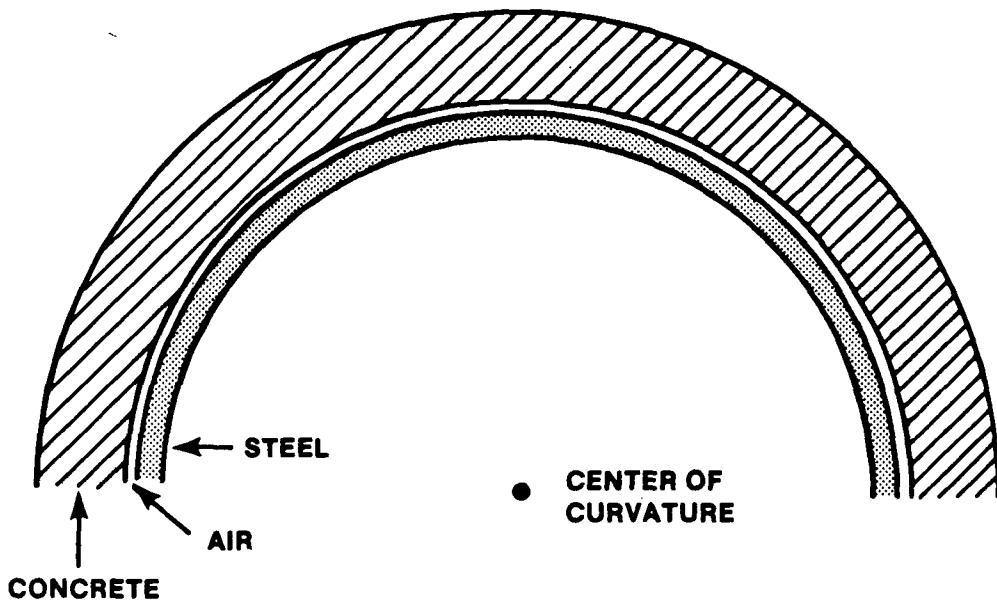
Cylindrical Structure Consisting of a Steel Liner, Air Gap, and Thick Concrete Wall
